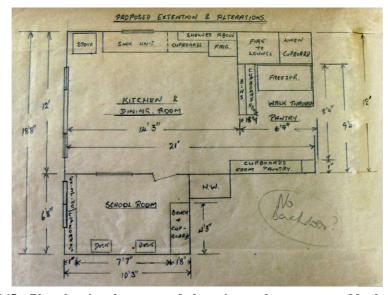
Plan showing the proposed alterations to house one to add schoolroom.
